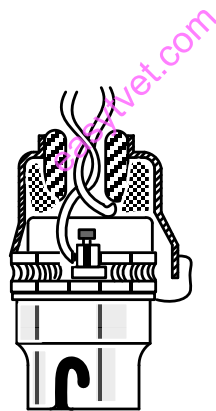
cord grip and flexible wired to a brass lamp holder terminal
